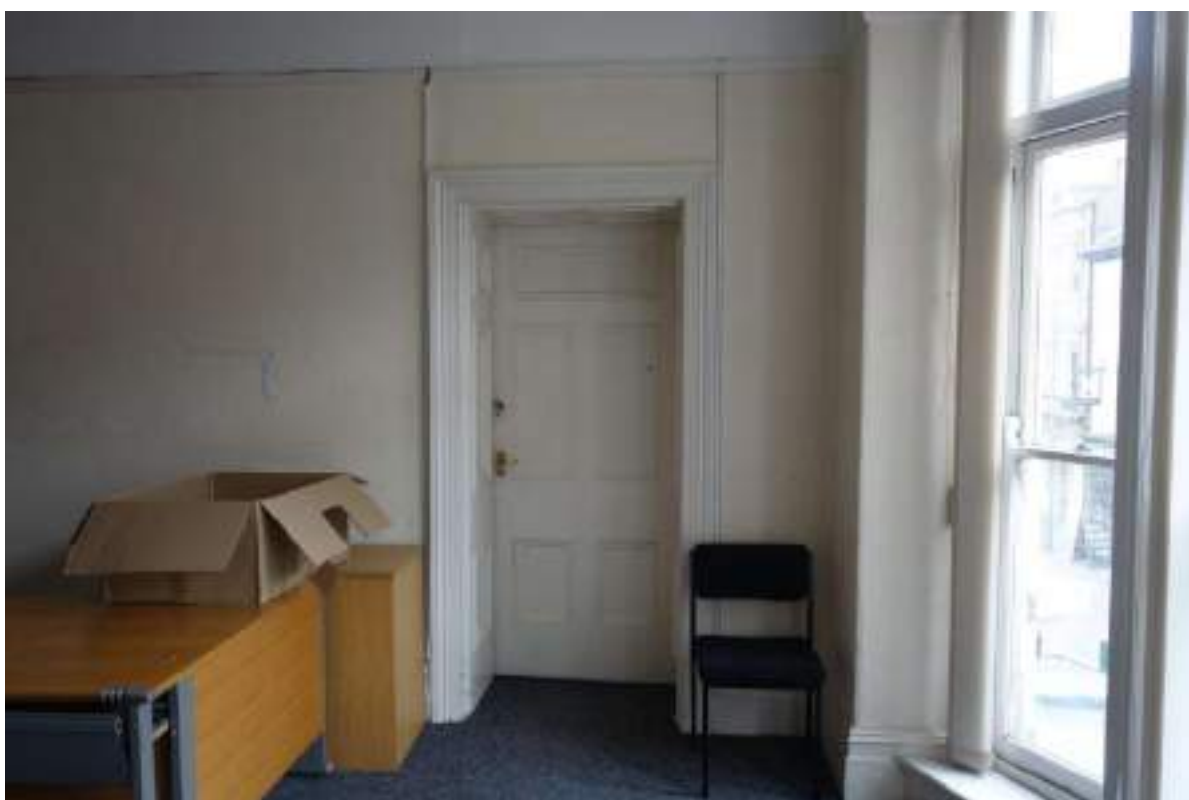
View looking W in FF Room 11, towards a deep doorway with wooden panelling.
